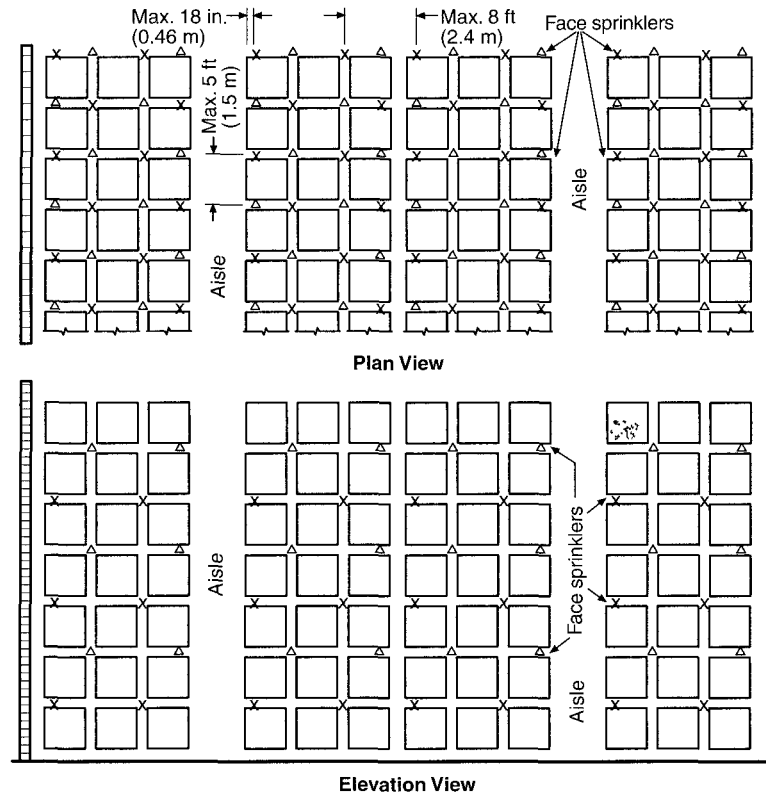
(f)* In-rack sprinkler arrangement, multiple-row racks, cartoned plastic and exposed unexpanded plastic, storage height over 25 ft (7.6 m).
